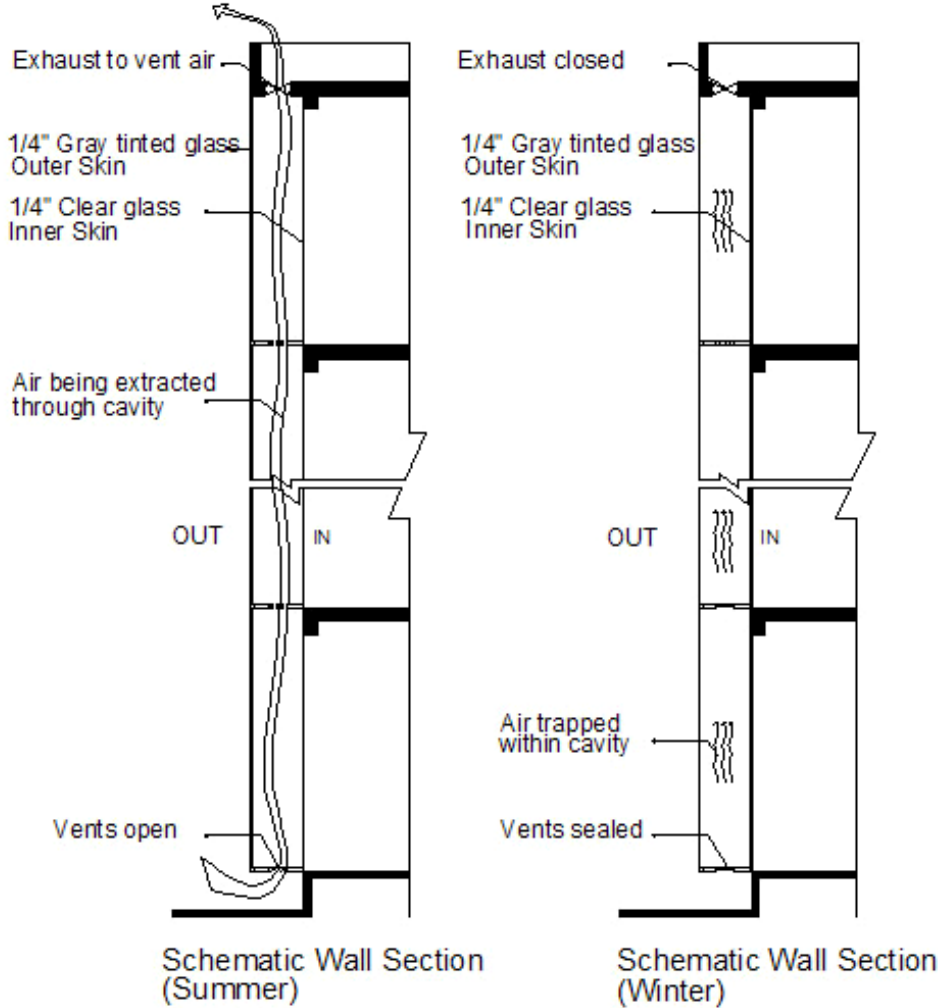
Schematic Wall Sections of Strategy One for Summer and Winter
